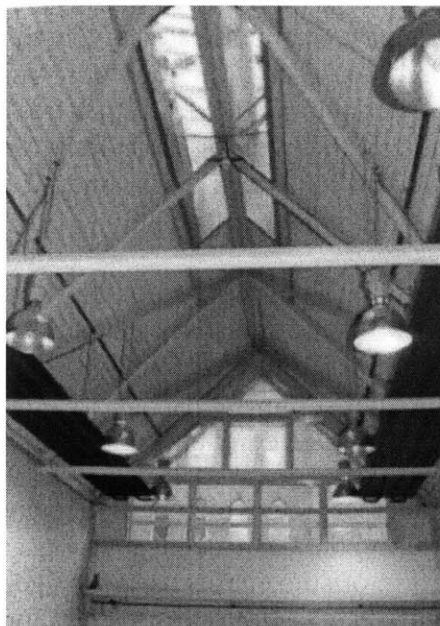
Mechanical engineering lab. At the top of this picture are motor-operated ridge vents. The inverted V-shape of the ceiling collects hot air and channels it out through the vents. A similar ceiling arrangement is featured on the top floor of the building. The actuators to the vents on the top floor were not made robustly enough and failed within a few weeks of the opening of the building, eliminating a critical component of the ventilation system. Skylights and gable glazing are used often to provide high levels of daylighting. In areas where artificial lighting is used, occupancy sensors are used to reduce energy consumption.
